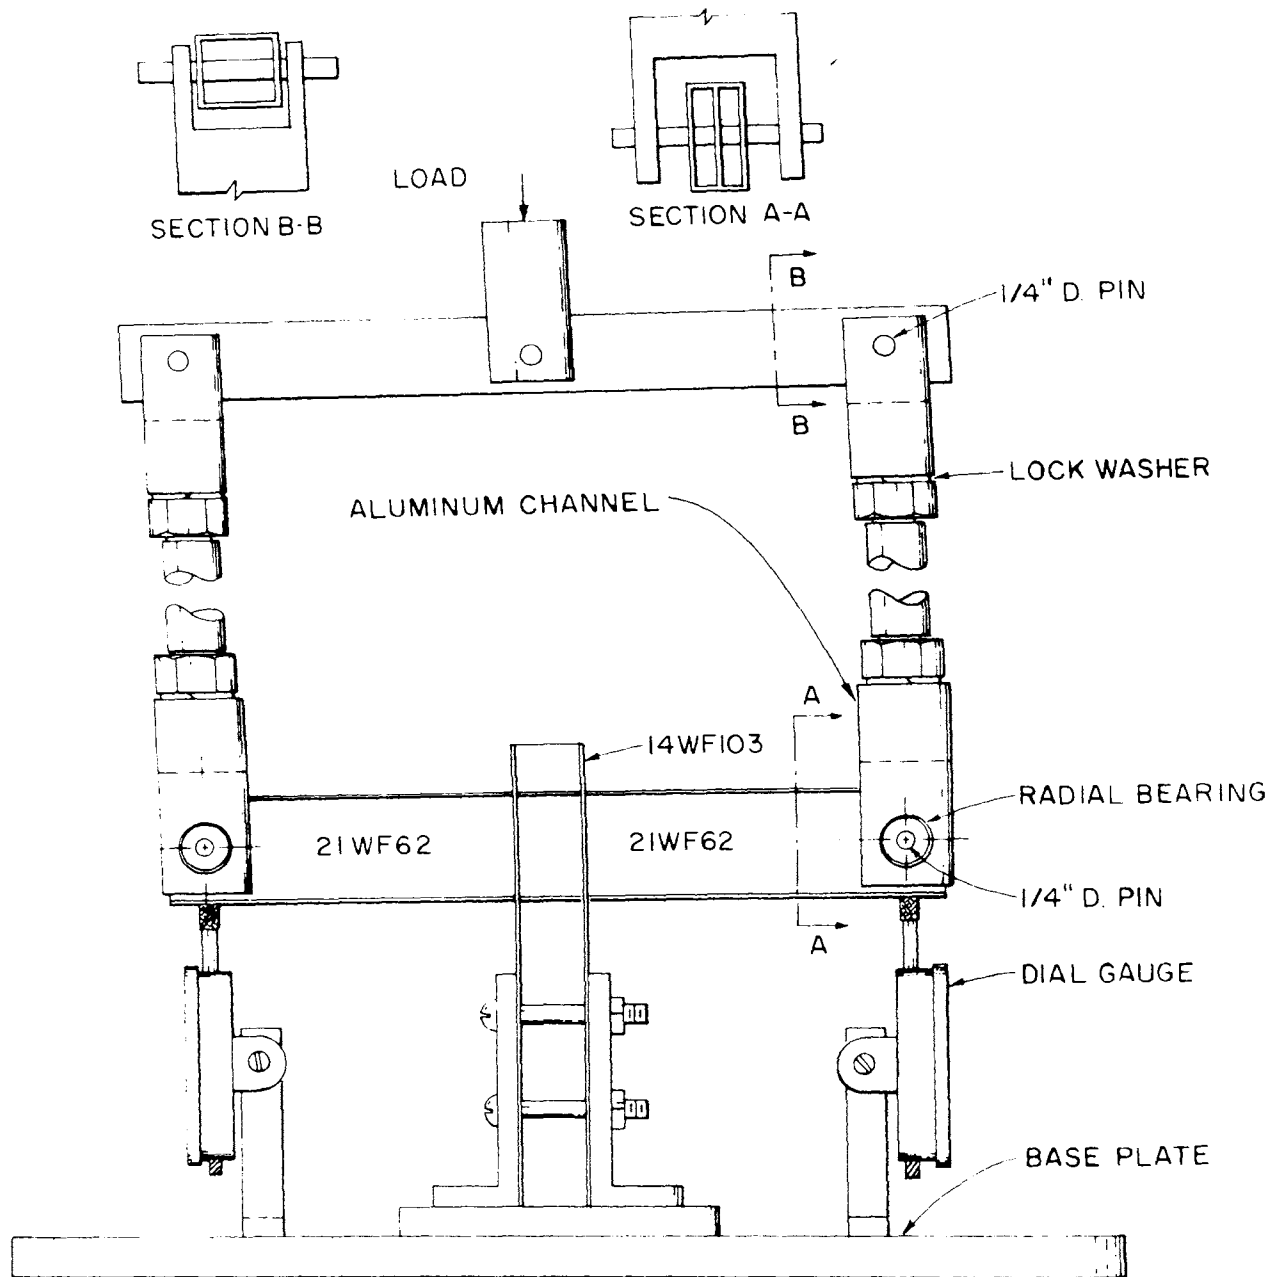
TEST SETUP FOR CANTILEVER CONNECTION
